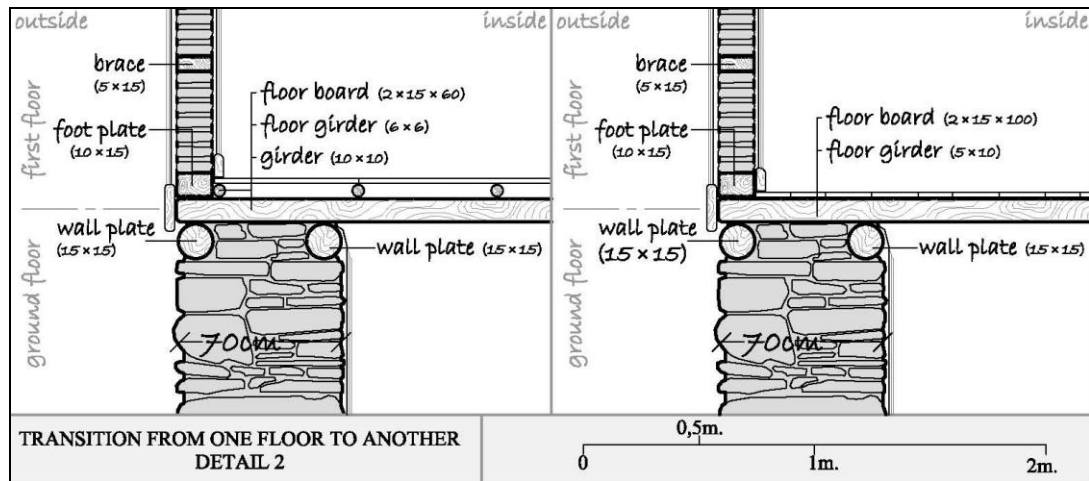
, Detail of use of masonry wall in the lower floor and timber frame wall in the upper floor; use of girder and floor girders together at floor change (left), use of only floor girders at floor change (right)
